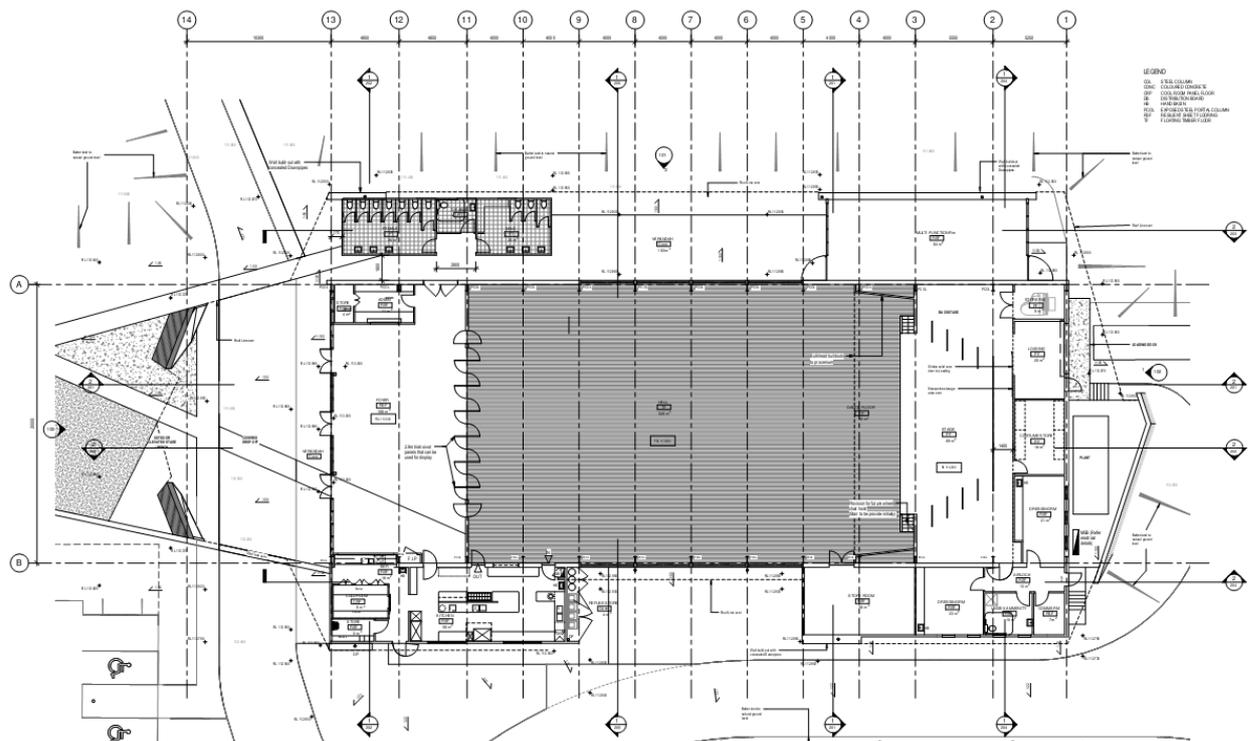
Civic Center Floor Plan (courtesy Thomson Adsett)
